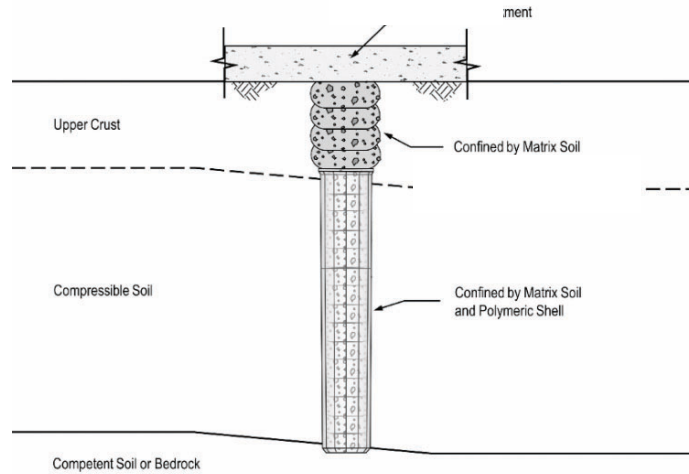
(a). Installation of confined aggregate pier with outer HDPE sleeve;
